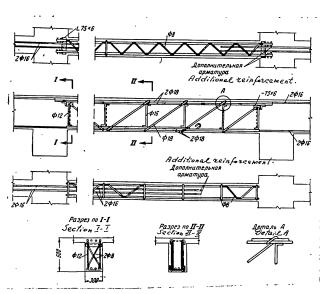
DETAILS OF THE RIGID STEEL WELLED SKELETON REINFORCEMENT OF THE MONOLITHIC REINFORCED CONCRETE FRAMES SHOWN ON PLATE 20A.
